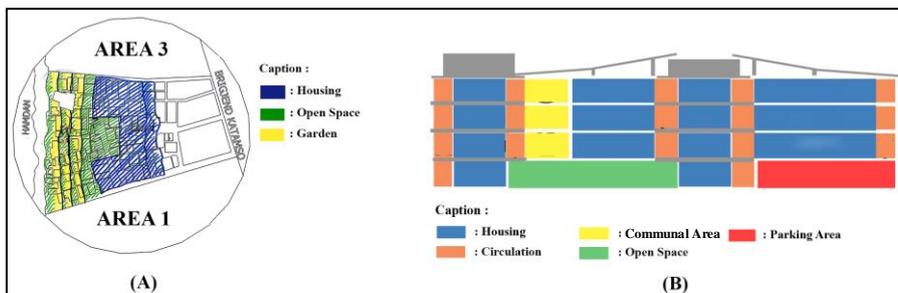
Zoning Concepts Site (A) and Mass of Building (B)
